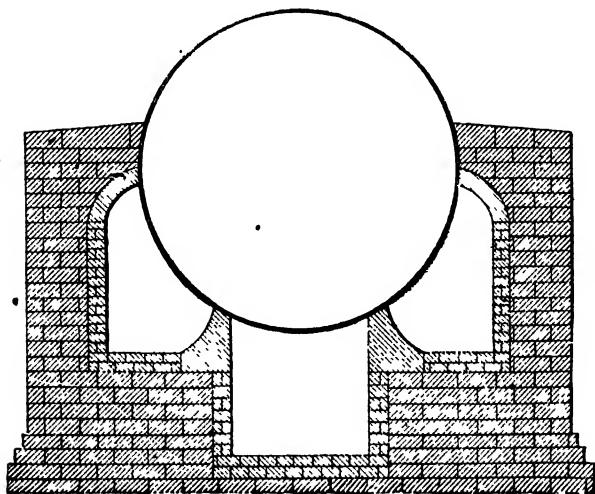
IMPROVED METHOD OF SETTING BOILERS
